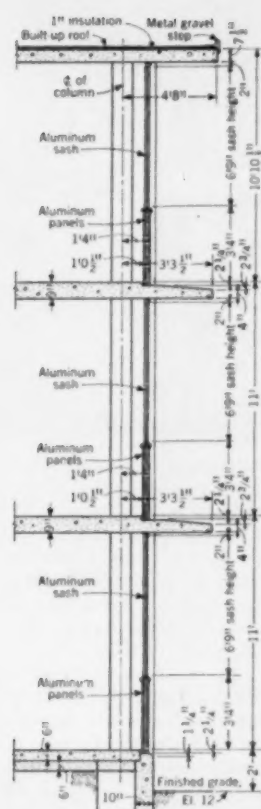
Slabs cantilever over sides of building, but not over ends. Ends of structure are reinforced concrete while sides have aluminum spandrels and sash. Floors will be covered with asphalt tile.
